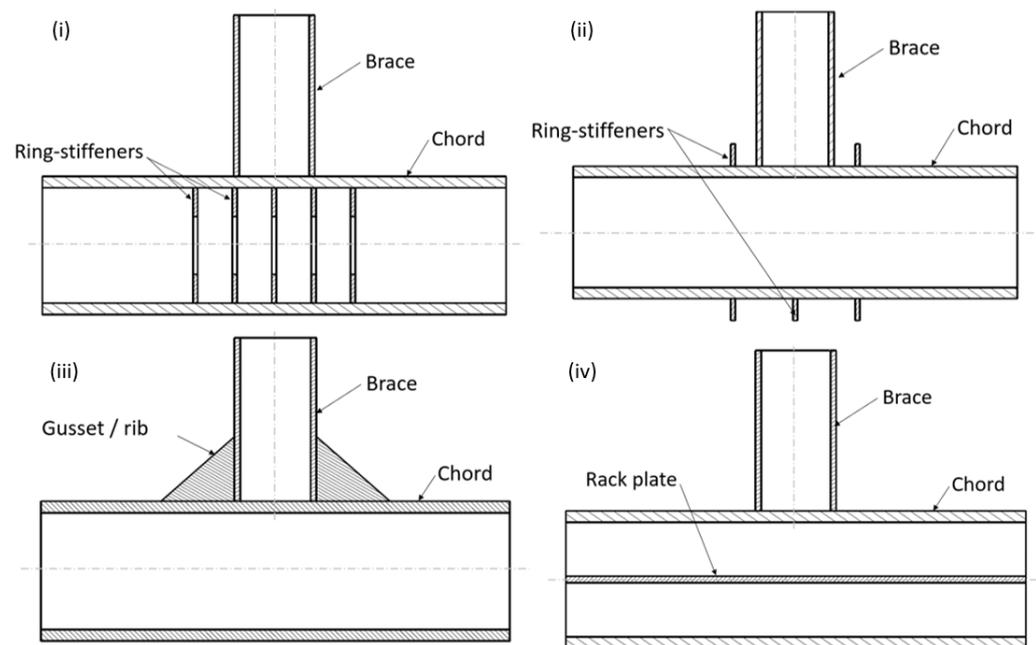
Different arrangements of stiffener welded T-joint. (i) Internal ring stiffened, (ii) external ring stiffened, (iii) rib stiffened, (iv) rack plate stiffened.
